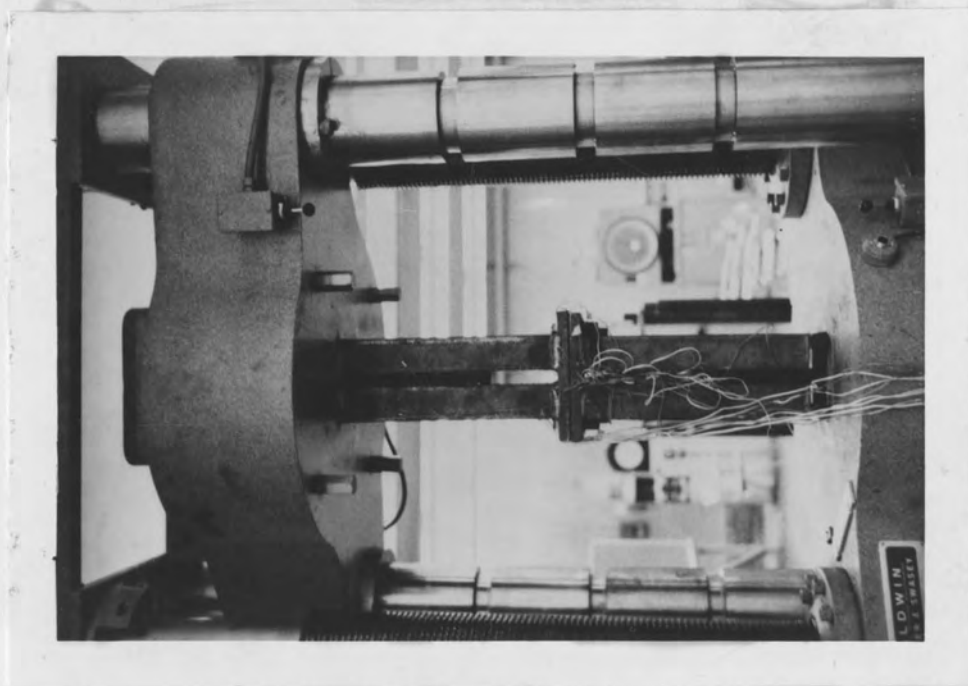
SPECIMEN IN THE TESTING MACHINE
